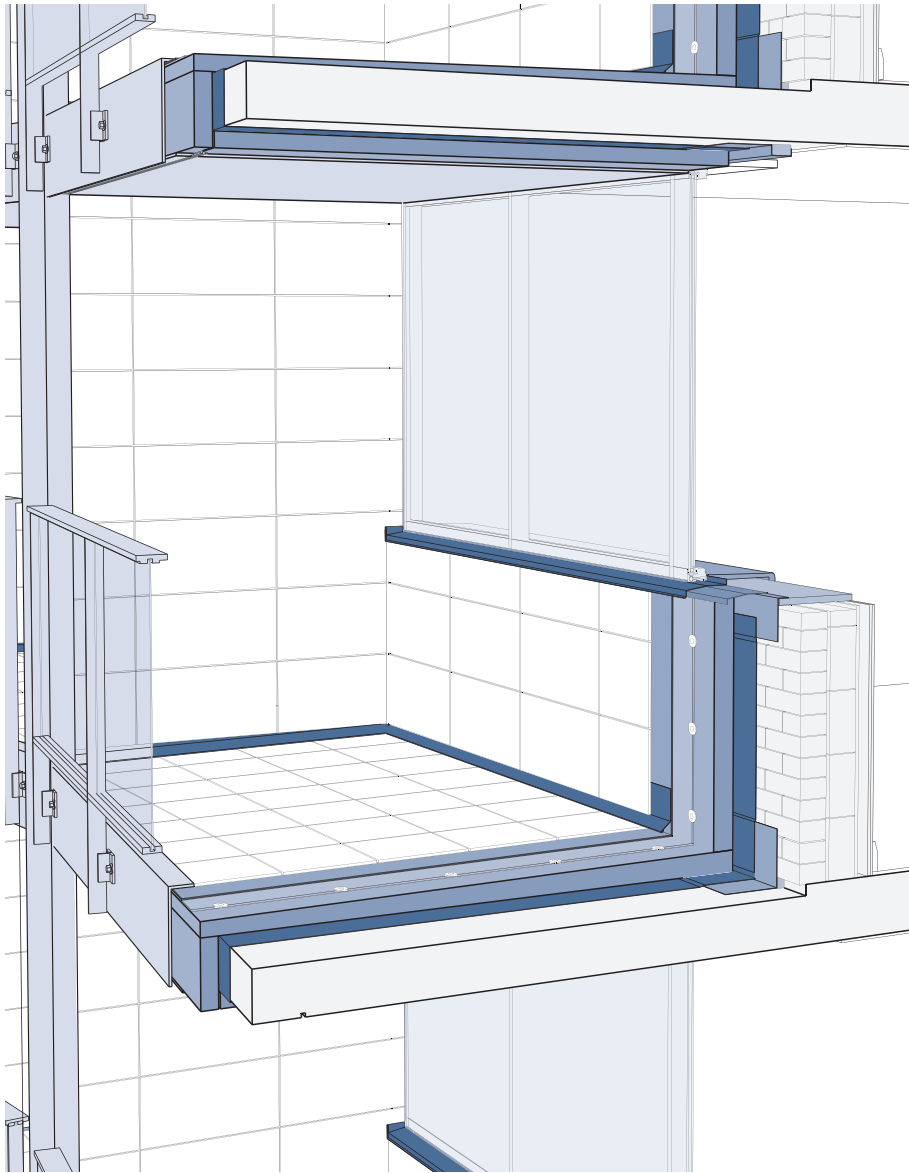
Installation of the tile and grout proceeds, followed by caulking as specified. A new balcony guard is installed to complete the balcony overcladding assembly.
